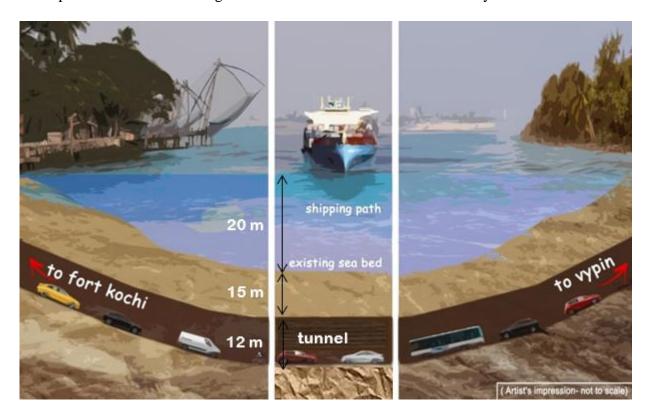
Schematic Longitudinal Profile of Tunnel
